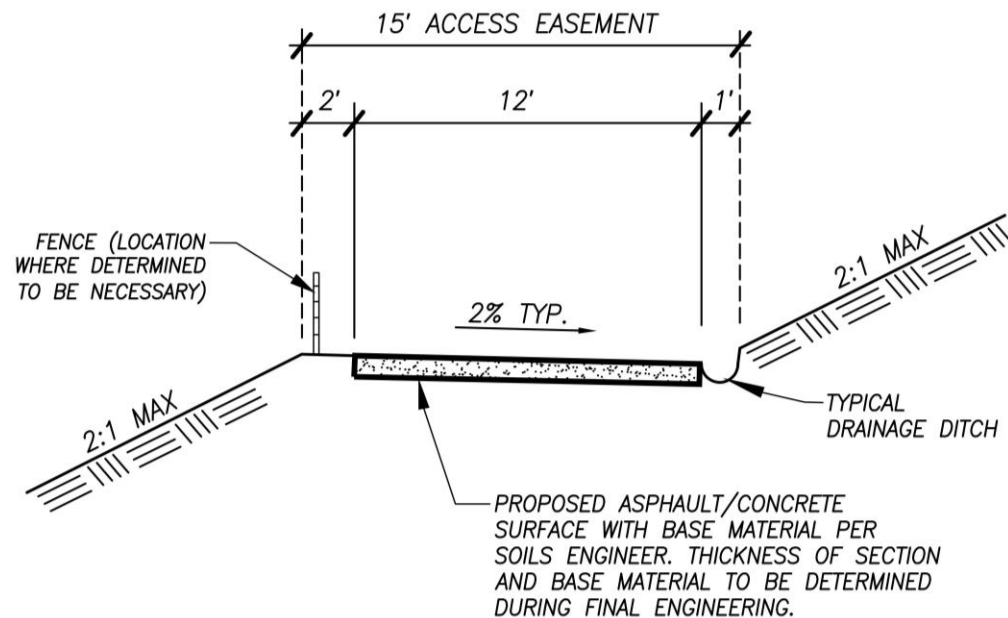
Typical Storm Drain Maintenance Access Road
